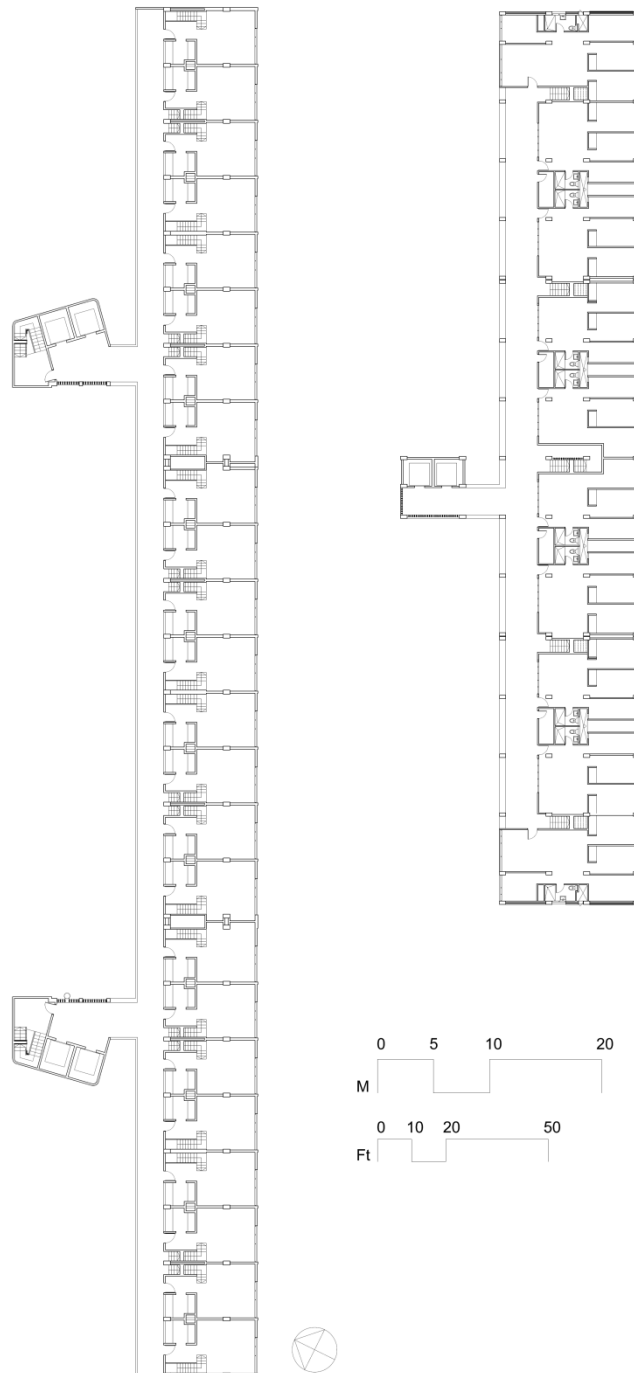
Floor plans of Cerro Grande (left) and the 1956 modified Diego de Losada (right)
